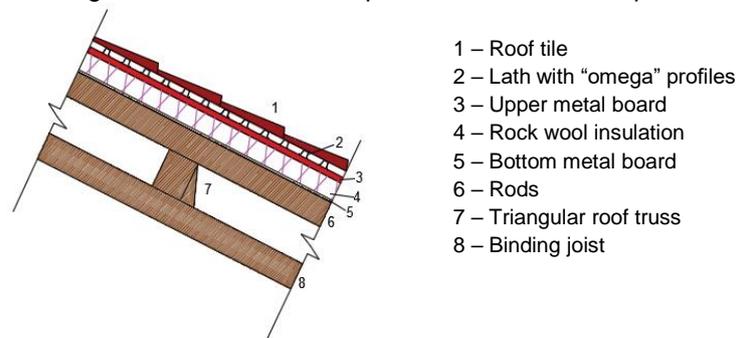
CROSS SECTION OF THE ROOF (SOLUTION Nº2). DRAWING WITHOUT SCALE.
